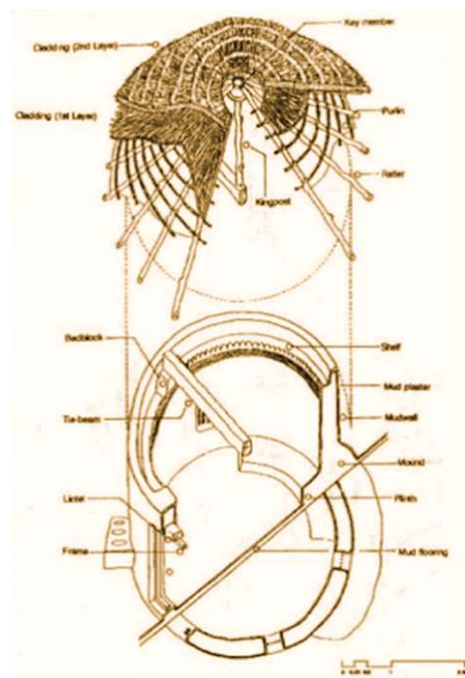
Exploded view of construction detail (Source: Lathiya, 2016)
